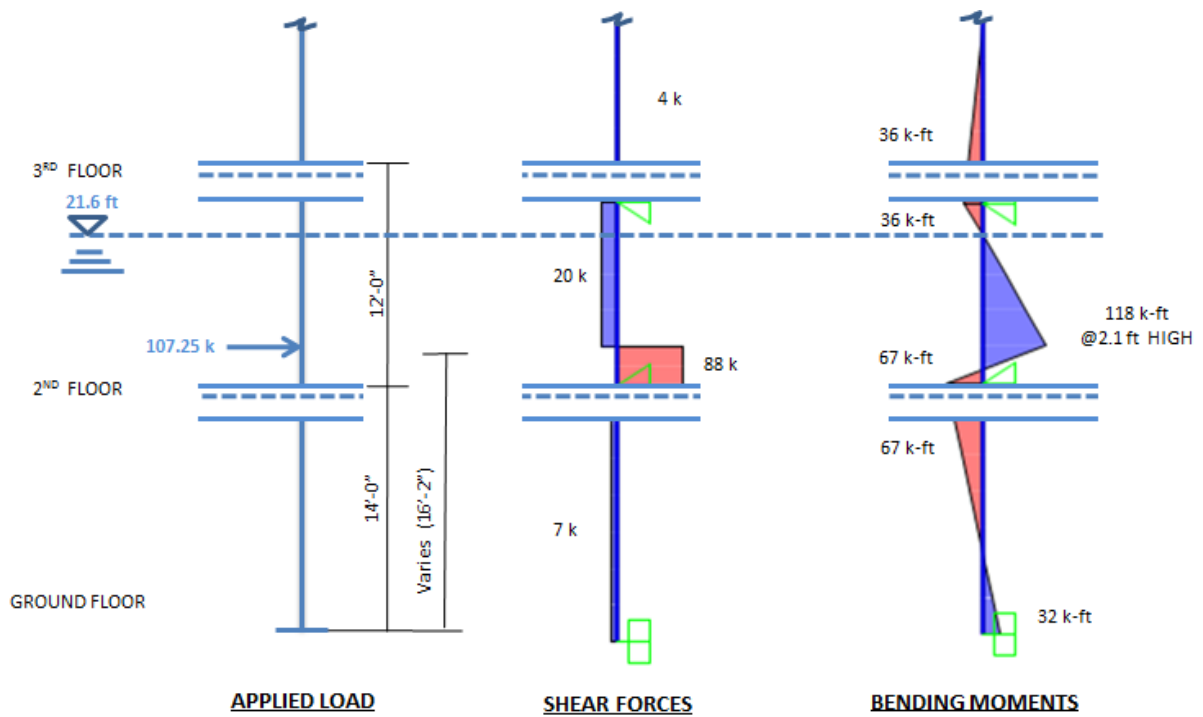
Impact load applied at "d" away from the end of column on the 2nd floor
